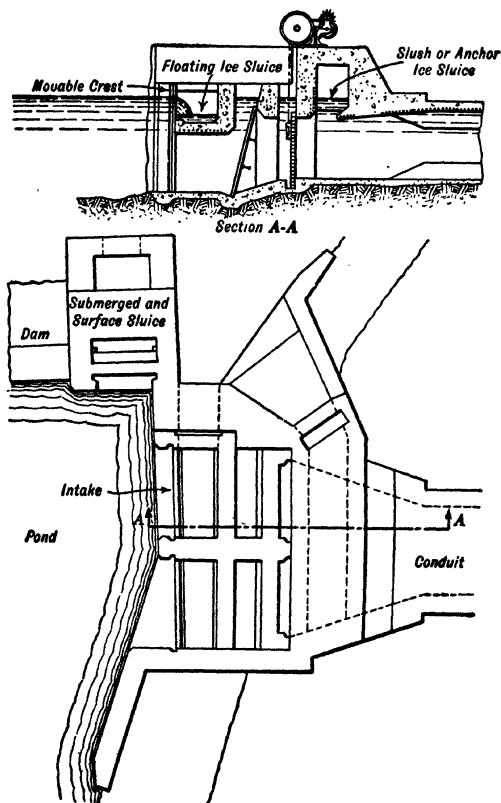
Arrangement of Ice Sluice at Plant No. 3, Deerfield River, New England Power Co.
